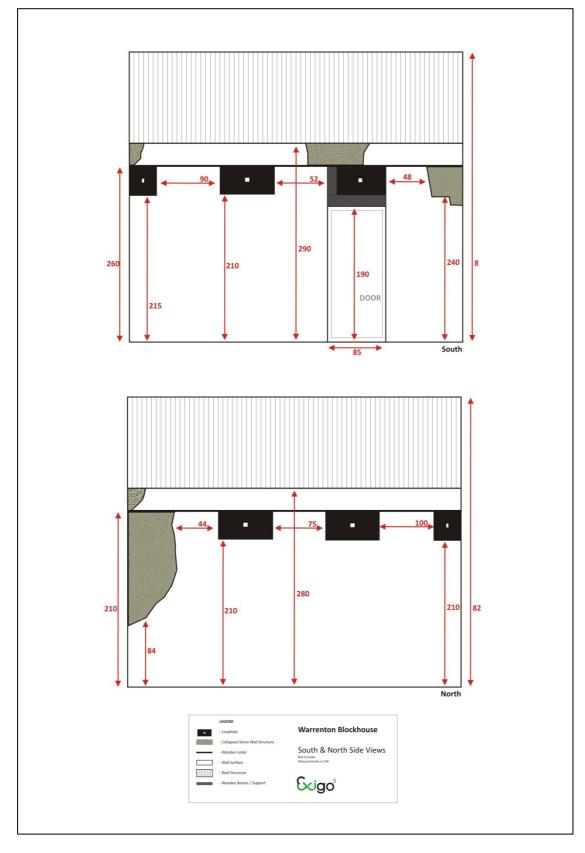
Plan of south and north views of the Warrenton blockhouse structure.
